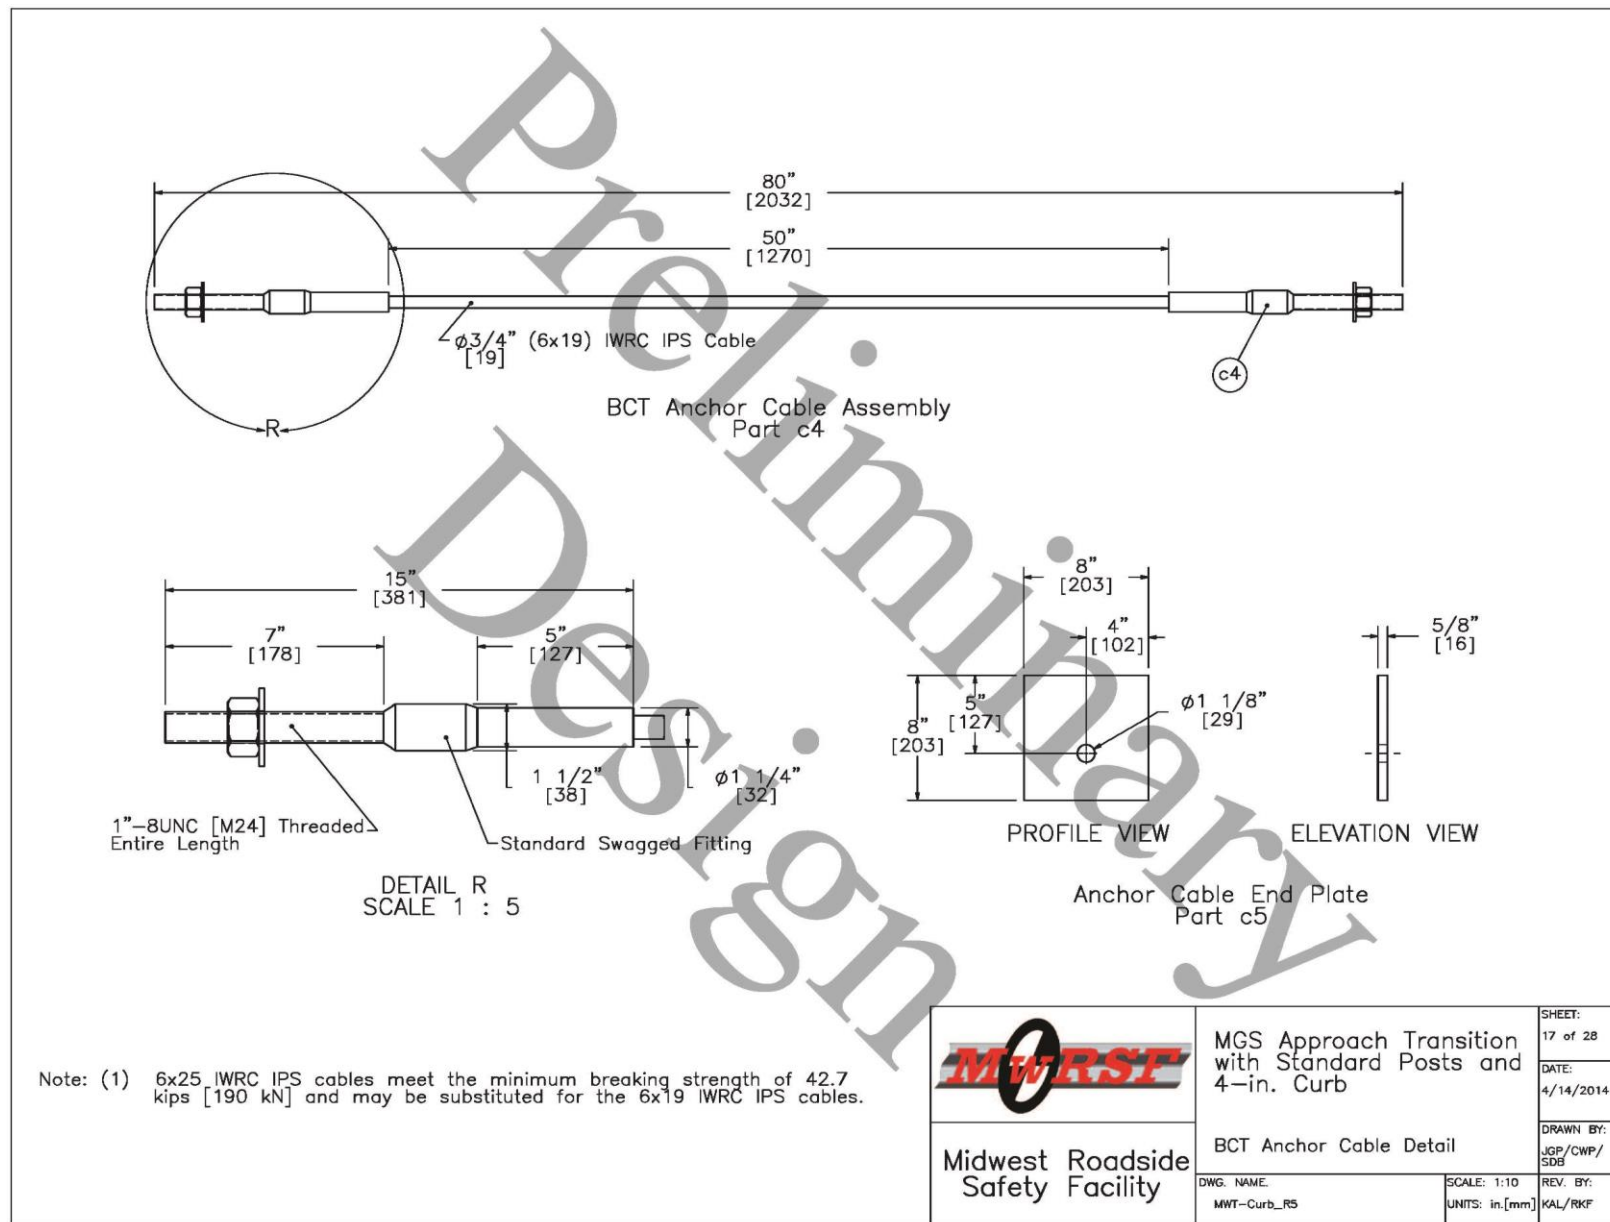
BCT Anchor Cable Detail, Test No. MWTC-1
